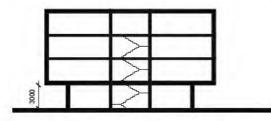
'Pavilion' building raised above ground level with parking or non-habitable shared facilities at ground level.
